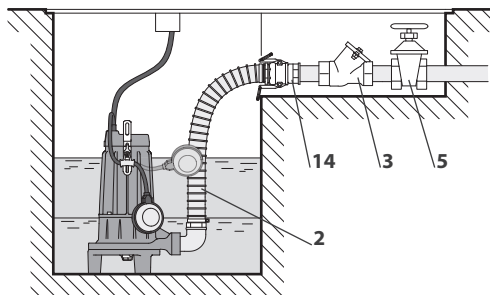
Fixed installation of a three-phase electric pump.
